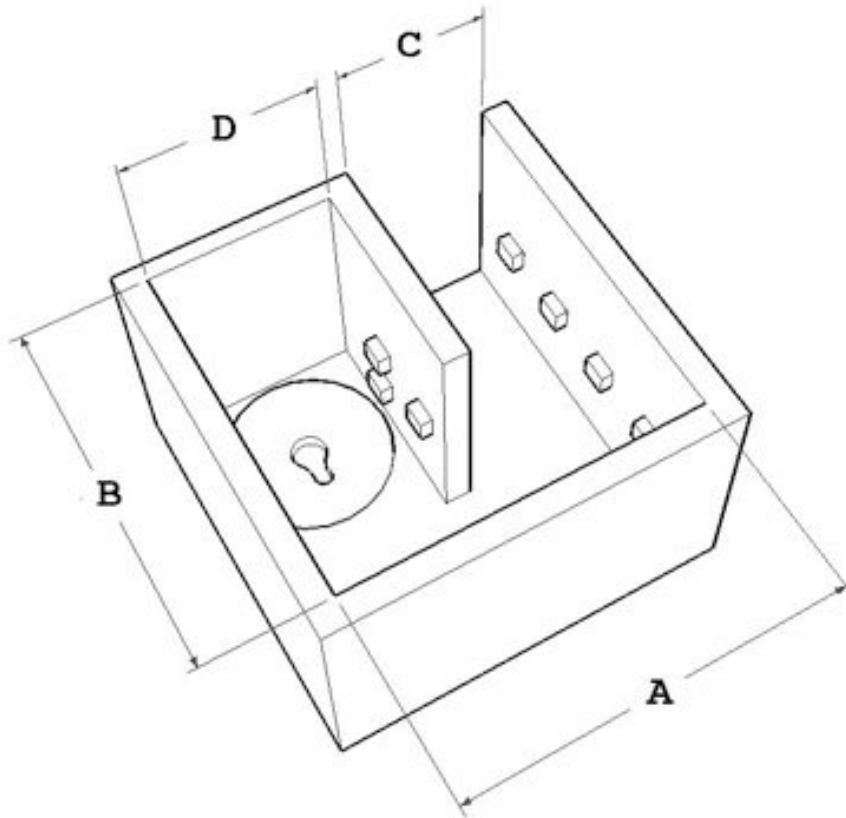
Diagram of a proposed latrine structure prototype. Entranceway wall dimensions facilitate use of both walls for support using one or both arms. Protruding bricks are placed along the walls to facilitate entrance access and squatting. With proposed dimensions, the enclosure area is optimized for latrine and bathing use, but with a minimum of space and therefore minimum required expenditure for materials. Wall height can be variable depending on preference and resources, although 2 m is recommended. (Recommended dimensions: A = 2.3 m, B = 2.2 m, C = 0.8 m, D = 1.3 m)
